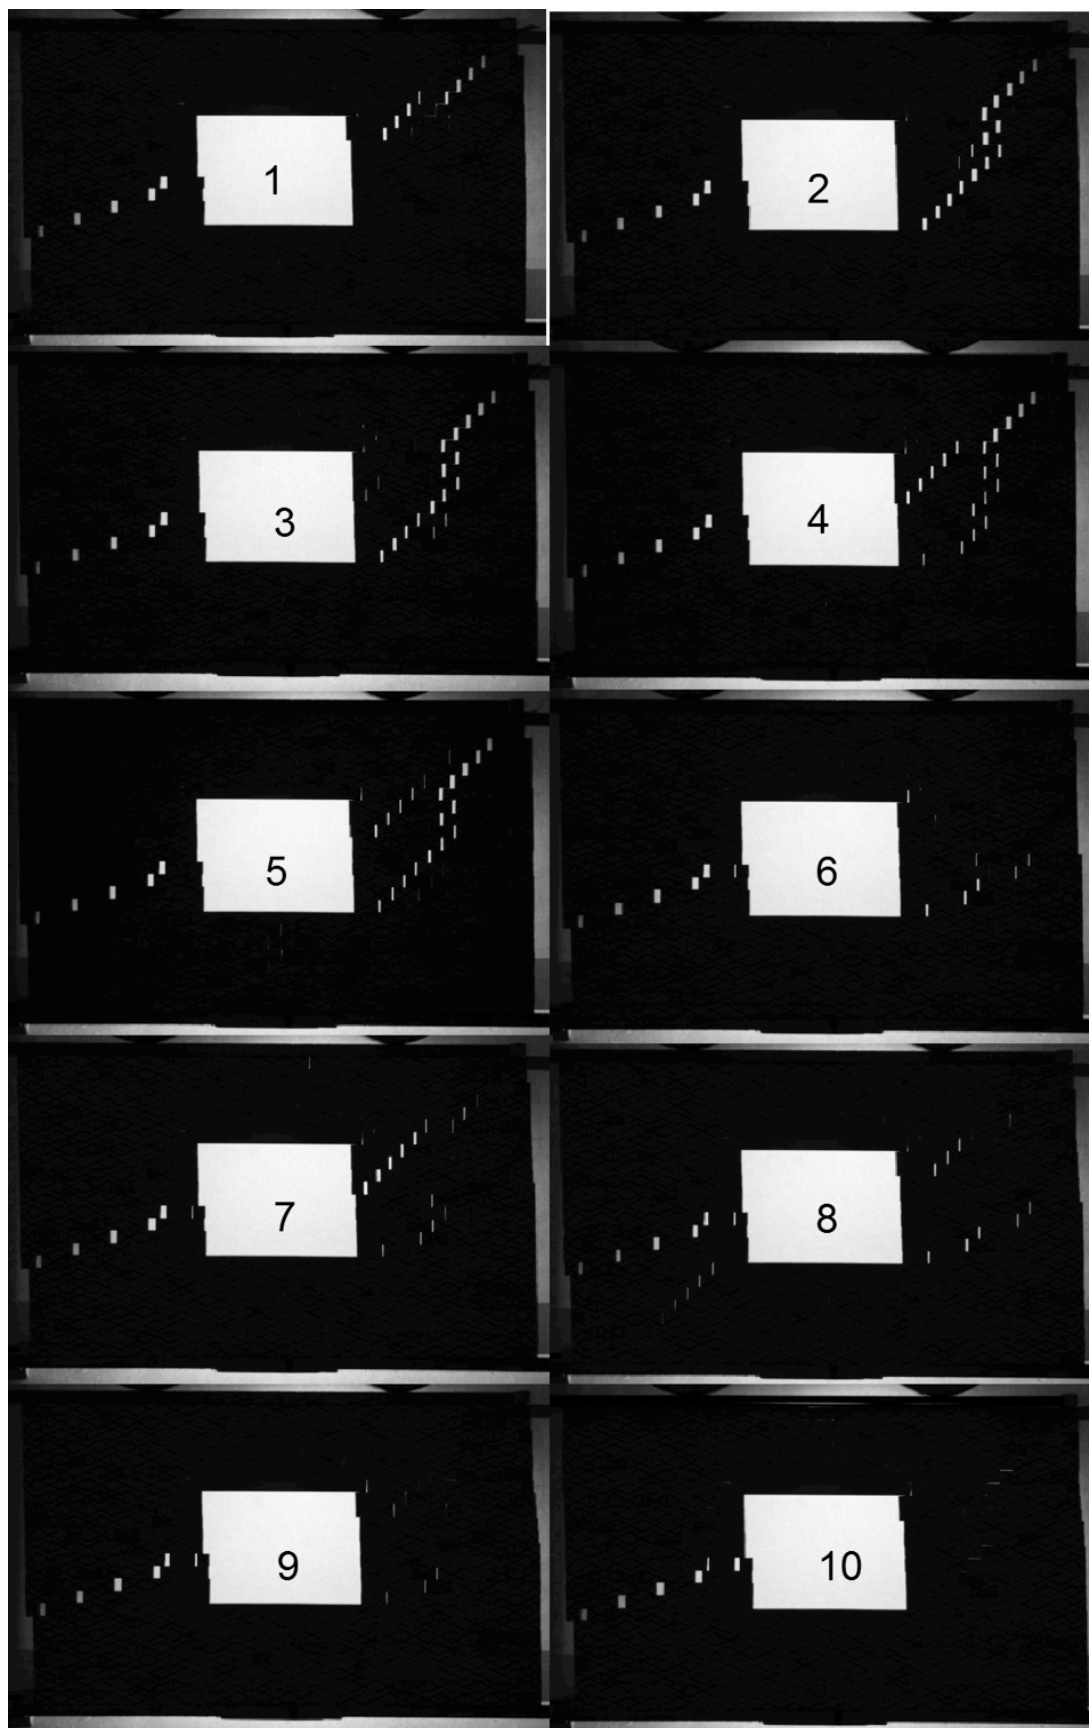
Non-Glued wall-with-opening specimens at 8 mm base displacement
